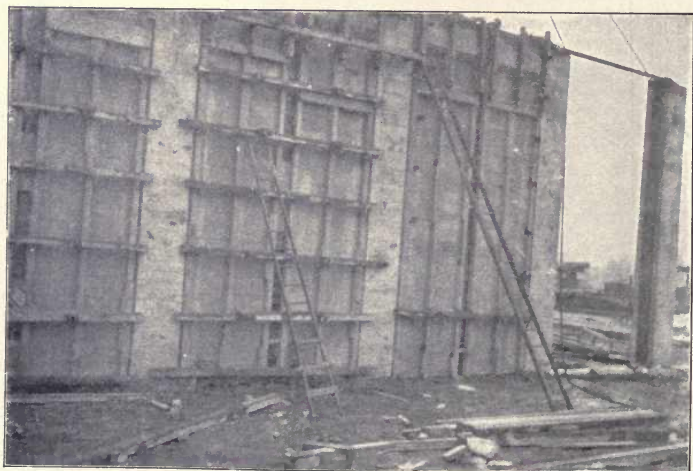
Panel Wall Forms for an Atlas Portland Cement Company Building. (See p. 173.)
